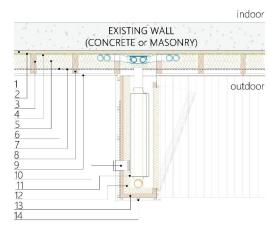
Balcony parapet integrated ventilation unit, stratigraphy and material specification: 1) 5) and 12) mineral insulation; 2) OSB panels; 3) Timber studs; 4)Vapour membrane; 6) Gypsum fiber board; 8) Watertight membrane; 9) Cladding; 10) HVAC unit; 11) Aerogel insulation; 13) CLT elements and 14) Wooden stud
